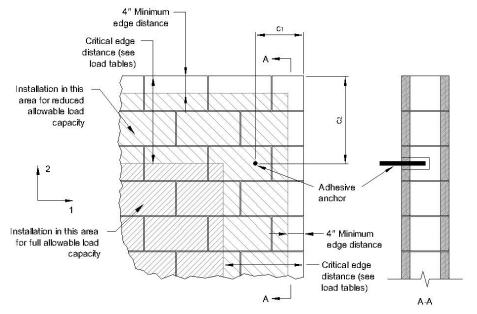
ALLOWABLE ANCHOR INSTALLATION LOCATIONS IN THE FACE OF GROUT-FILLED CONCRETE MASONRY (ASTM C90)
